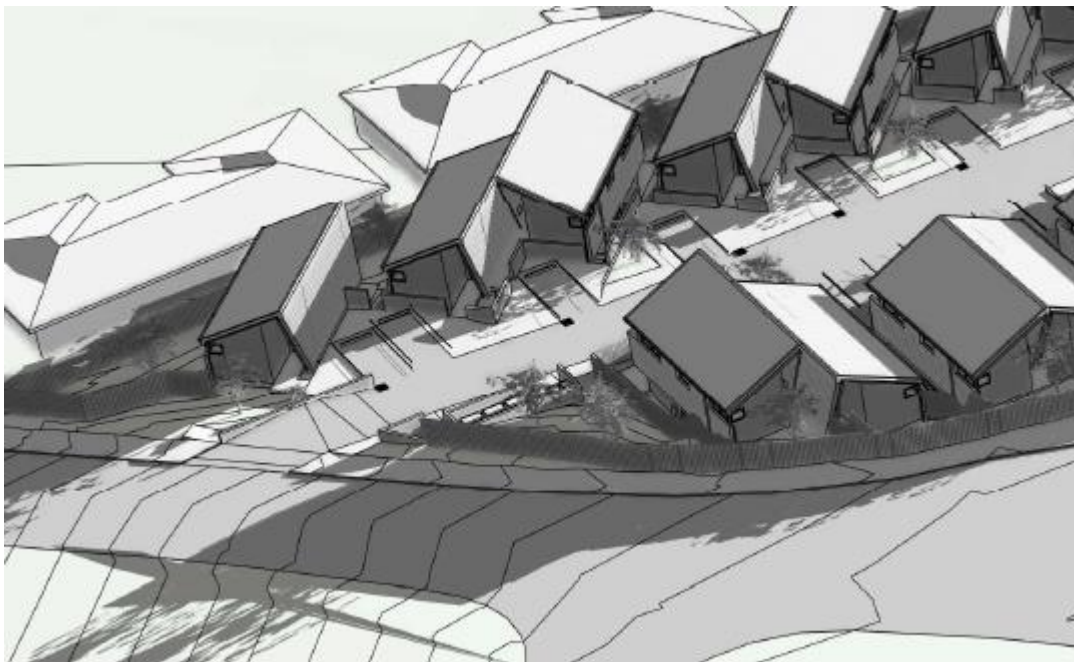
Extract from Shadow Diagrams, as prepared by Jaws Architects, drawing no. DA-08, showing bin enclosure area adjacent to dwelling unit no. 12
